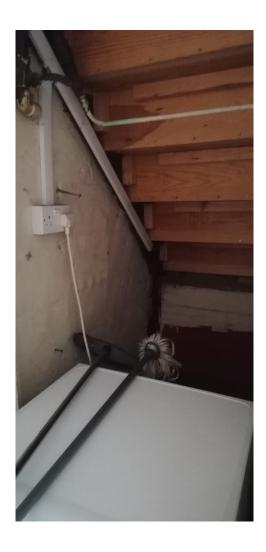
The existing ground to basement straircase is non-original. Most of the interior features have been lost prior to listing.
